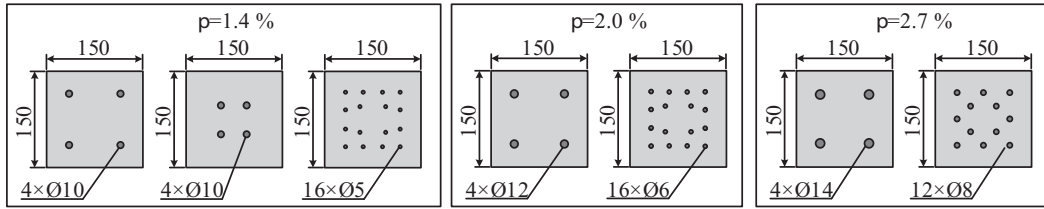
Cross-sections of the ties (all dimensions in mm).
